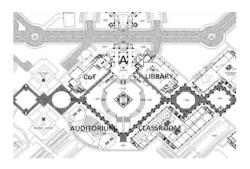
Amphitheater is connecting room of CoT Building, Library Building, Class Room Building, and Auditorium Building
